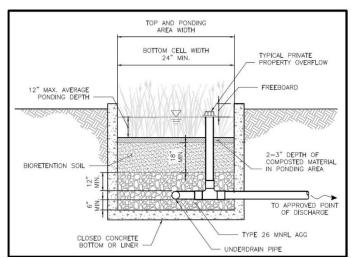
Typical section, 'Sunken'-style Bioretention Planter
